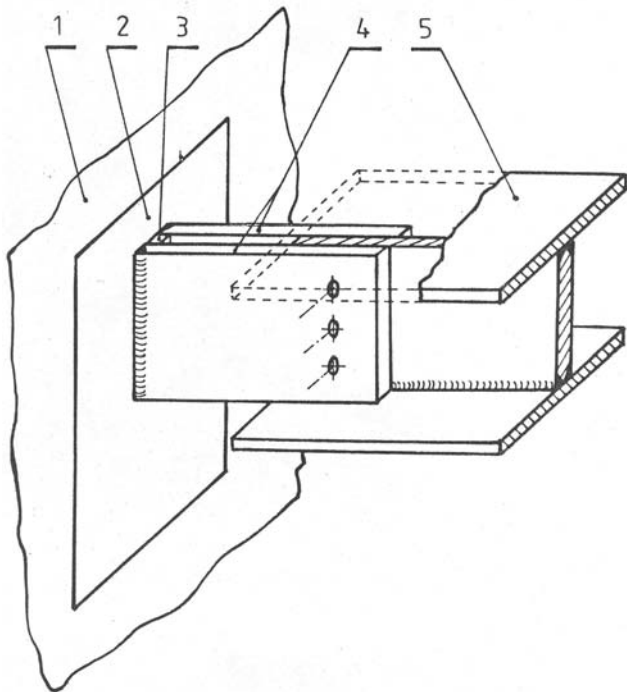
A view of a joint of a steel beam and a composite reinforced concrete structure; 1 – a composite reinforced concrete core of the tower, 2 – an insert plate, 3 – backing distance of plate girders, 4 - plate girders of screw joints, 5 – a steel beam
